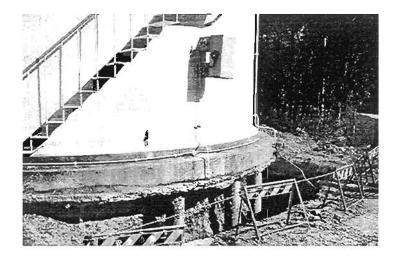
Excavated piles under a water tank at the Higashinada Power Station (Photo by C. Bolton)
